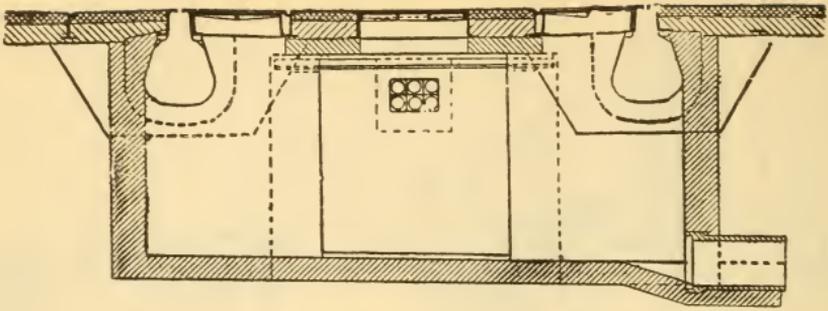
Drainage at Manhole of Conduit, Metropolitan Railroad, Washington, 1895.
